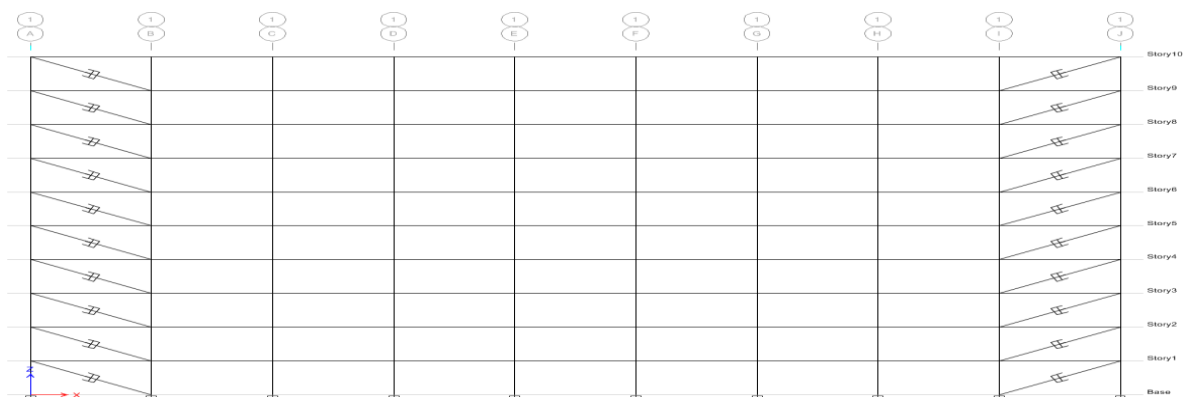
RBSC with FVD at Exterior Corners Elevation XZ-plane.
